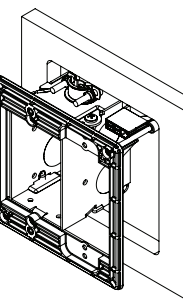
Mounting Bracket installed, rear view showing mounting ears
